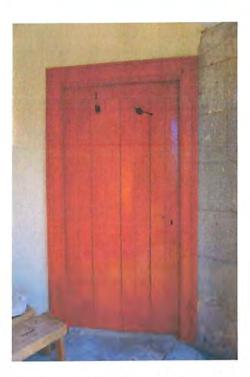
External view of origional door GD.02 from Porch to Bedroom. Note this door is painted shut.
